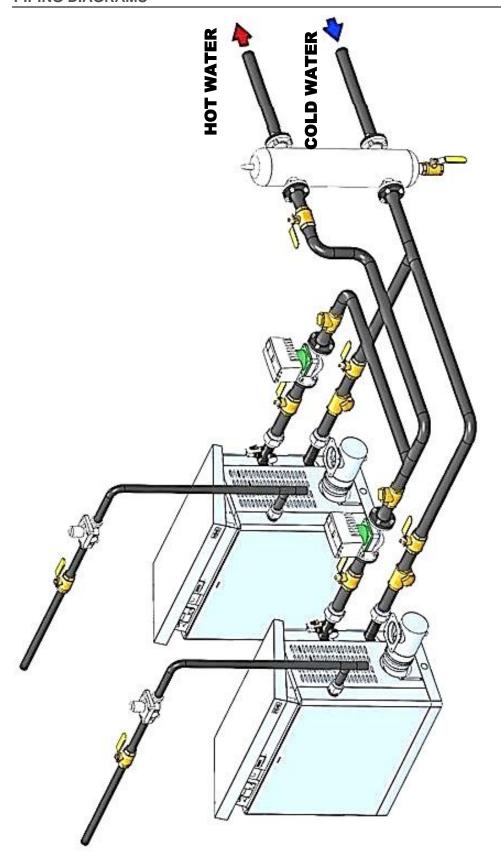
Modulex EXT Multiple Boiler Installation with Hydraulic Separator Installed
